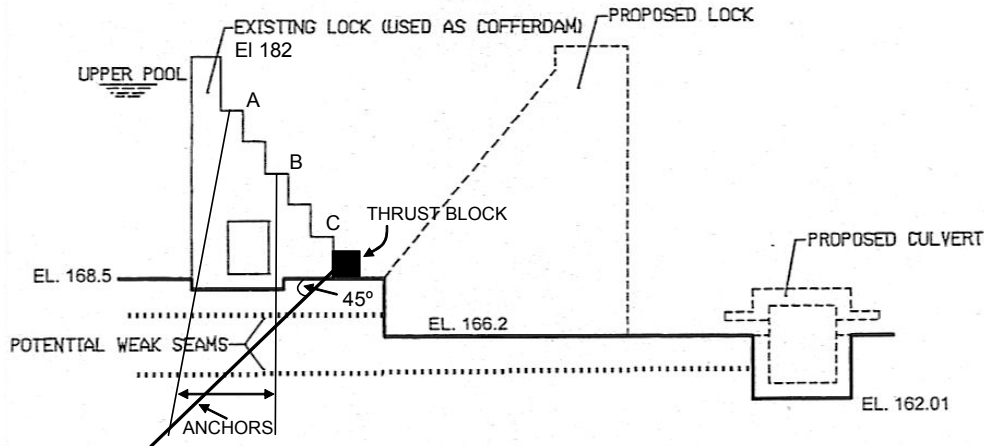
Schematic cross section showing “Daylighted” Weak Rock Seams and the typical positions of anchors, Marmet Locks and Dam, WV.
